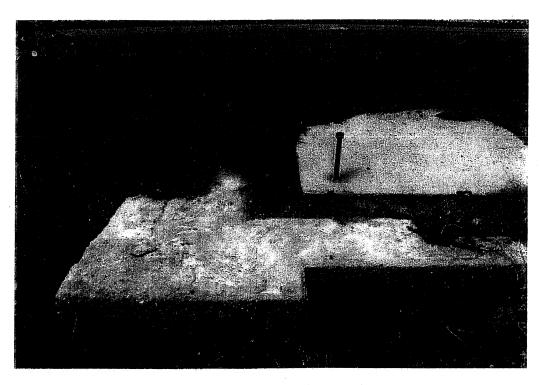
Concrete foundation from former structure located within Bolsa Chica Ecological Reserve (looking west).
